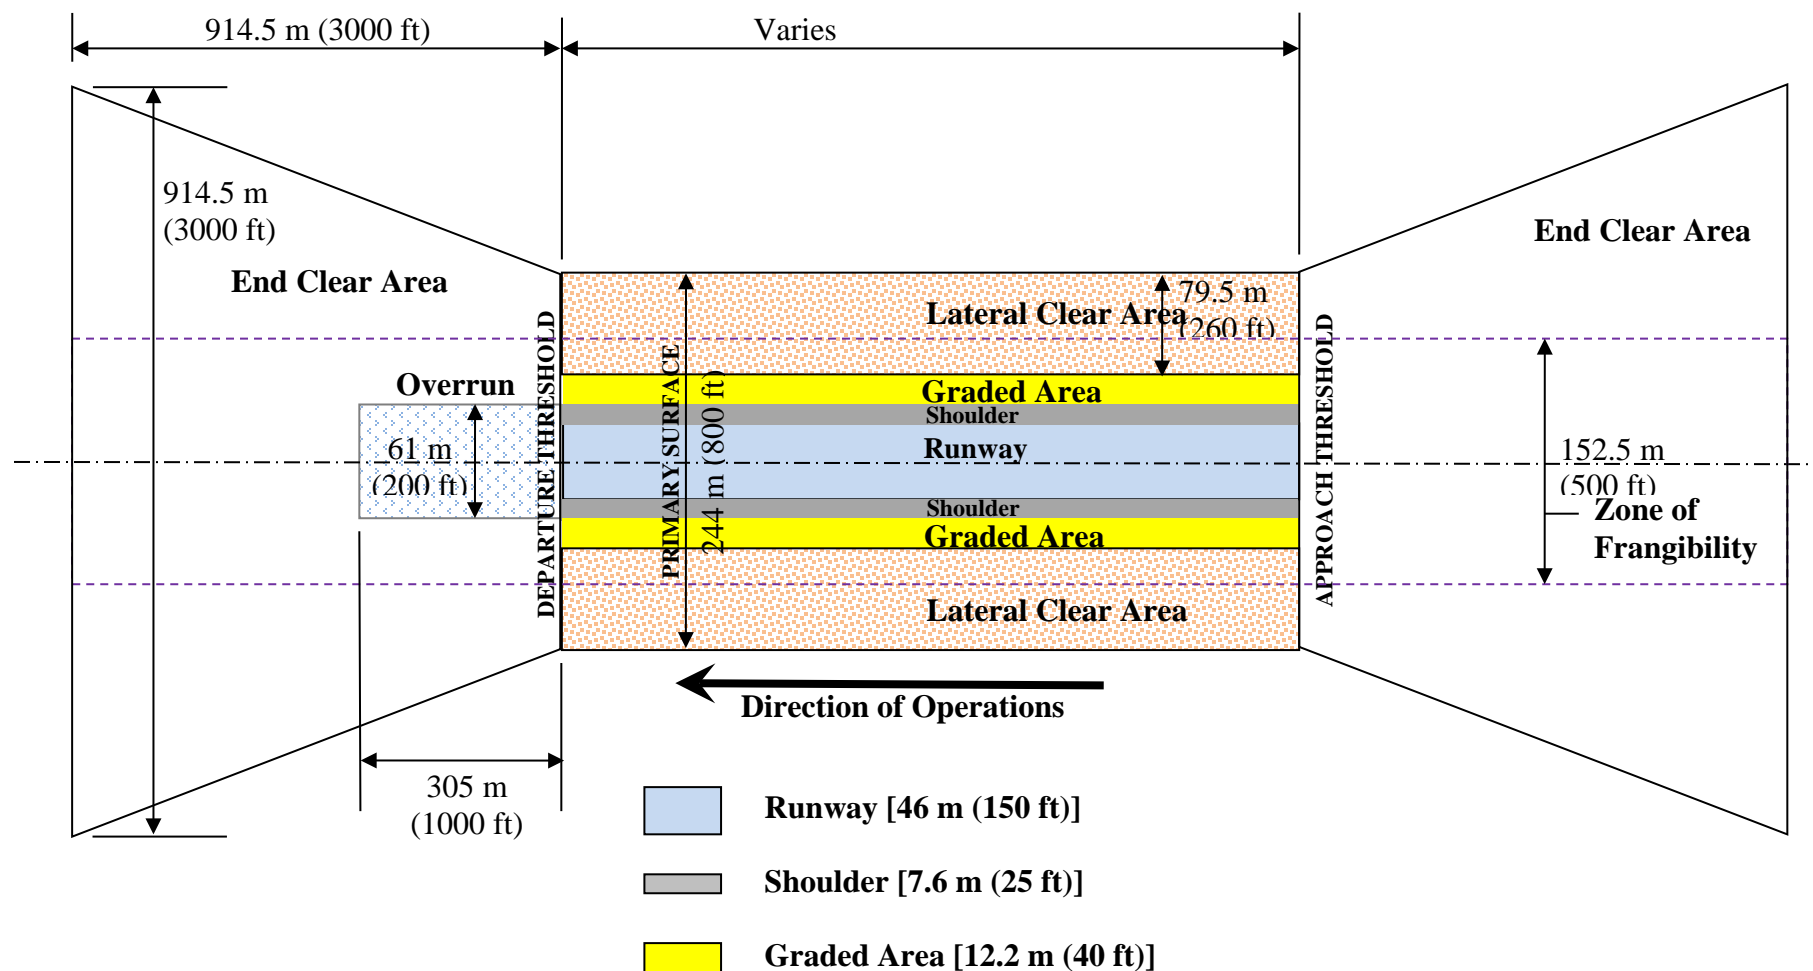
Typical Runway Layout for Uni-Directional Operations (Not to Scale)
